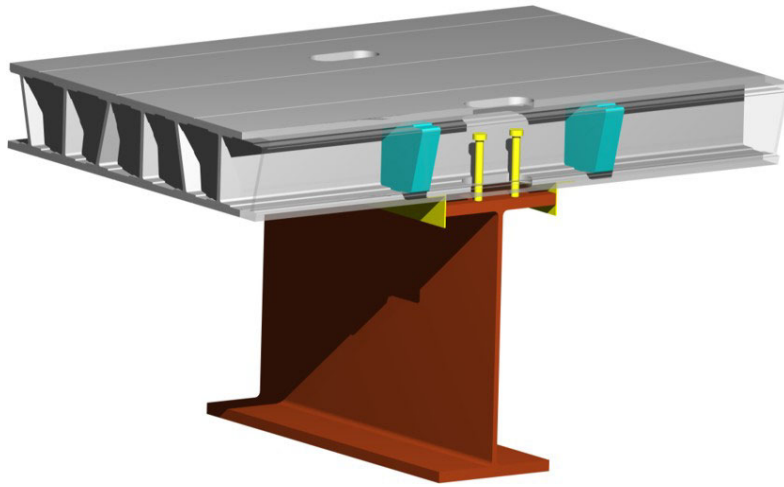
Typical Steel Beams to Deck Connection Detail (MMC)
